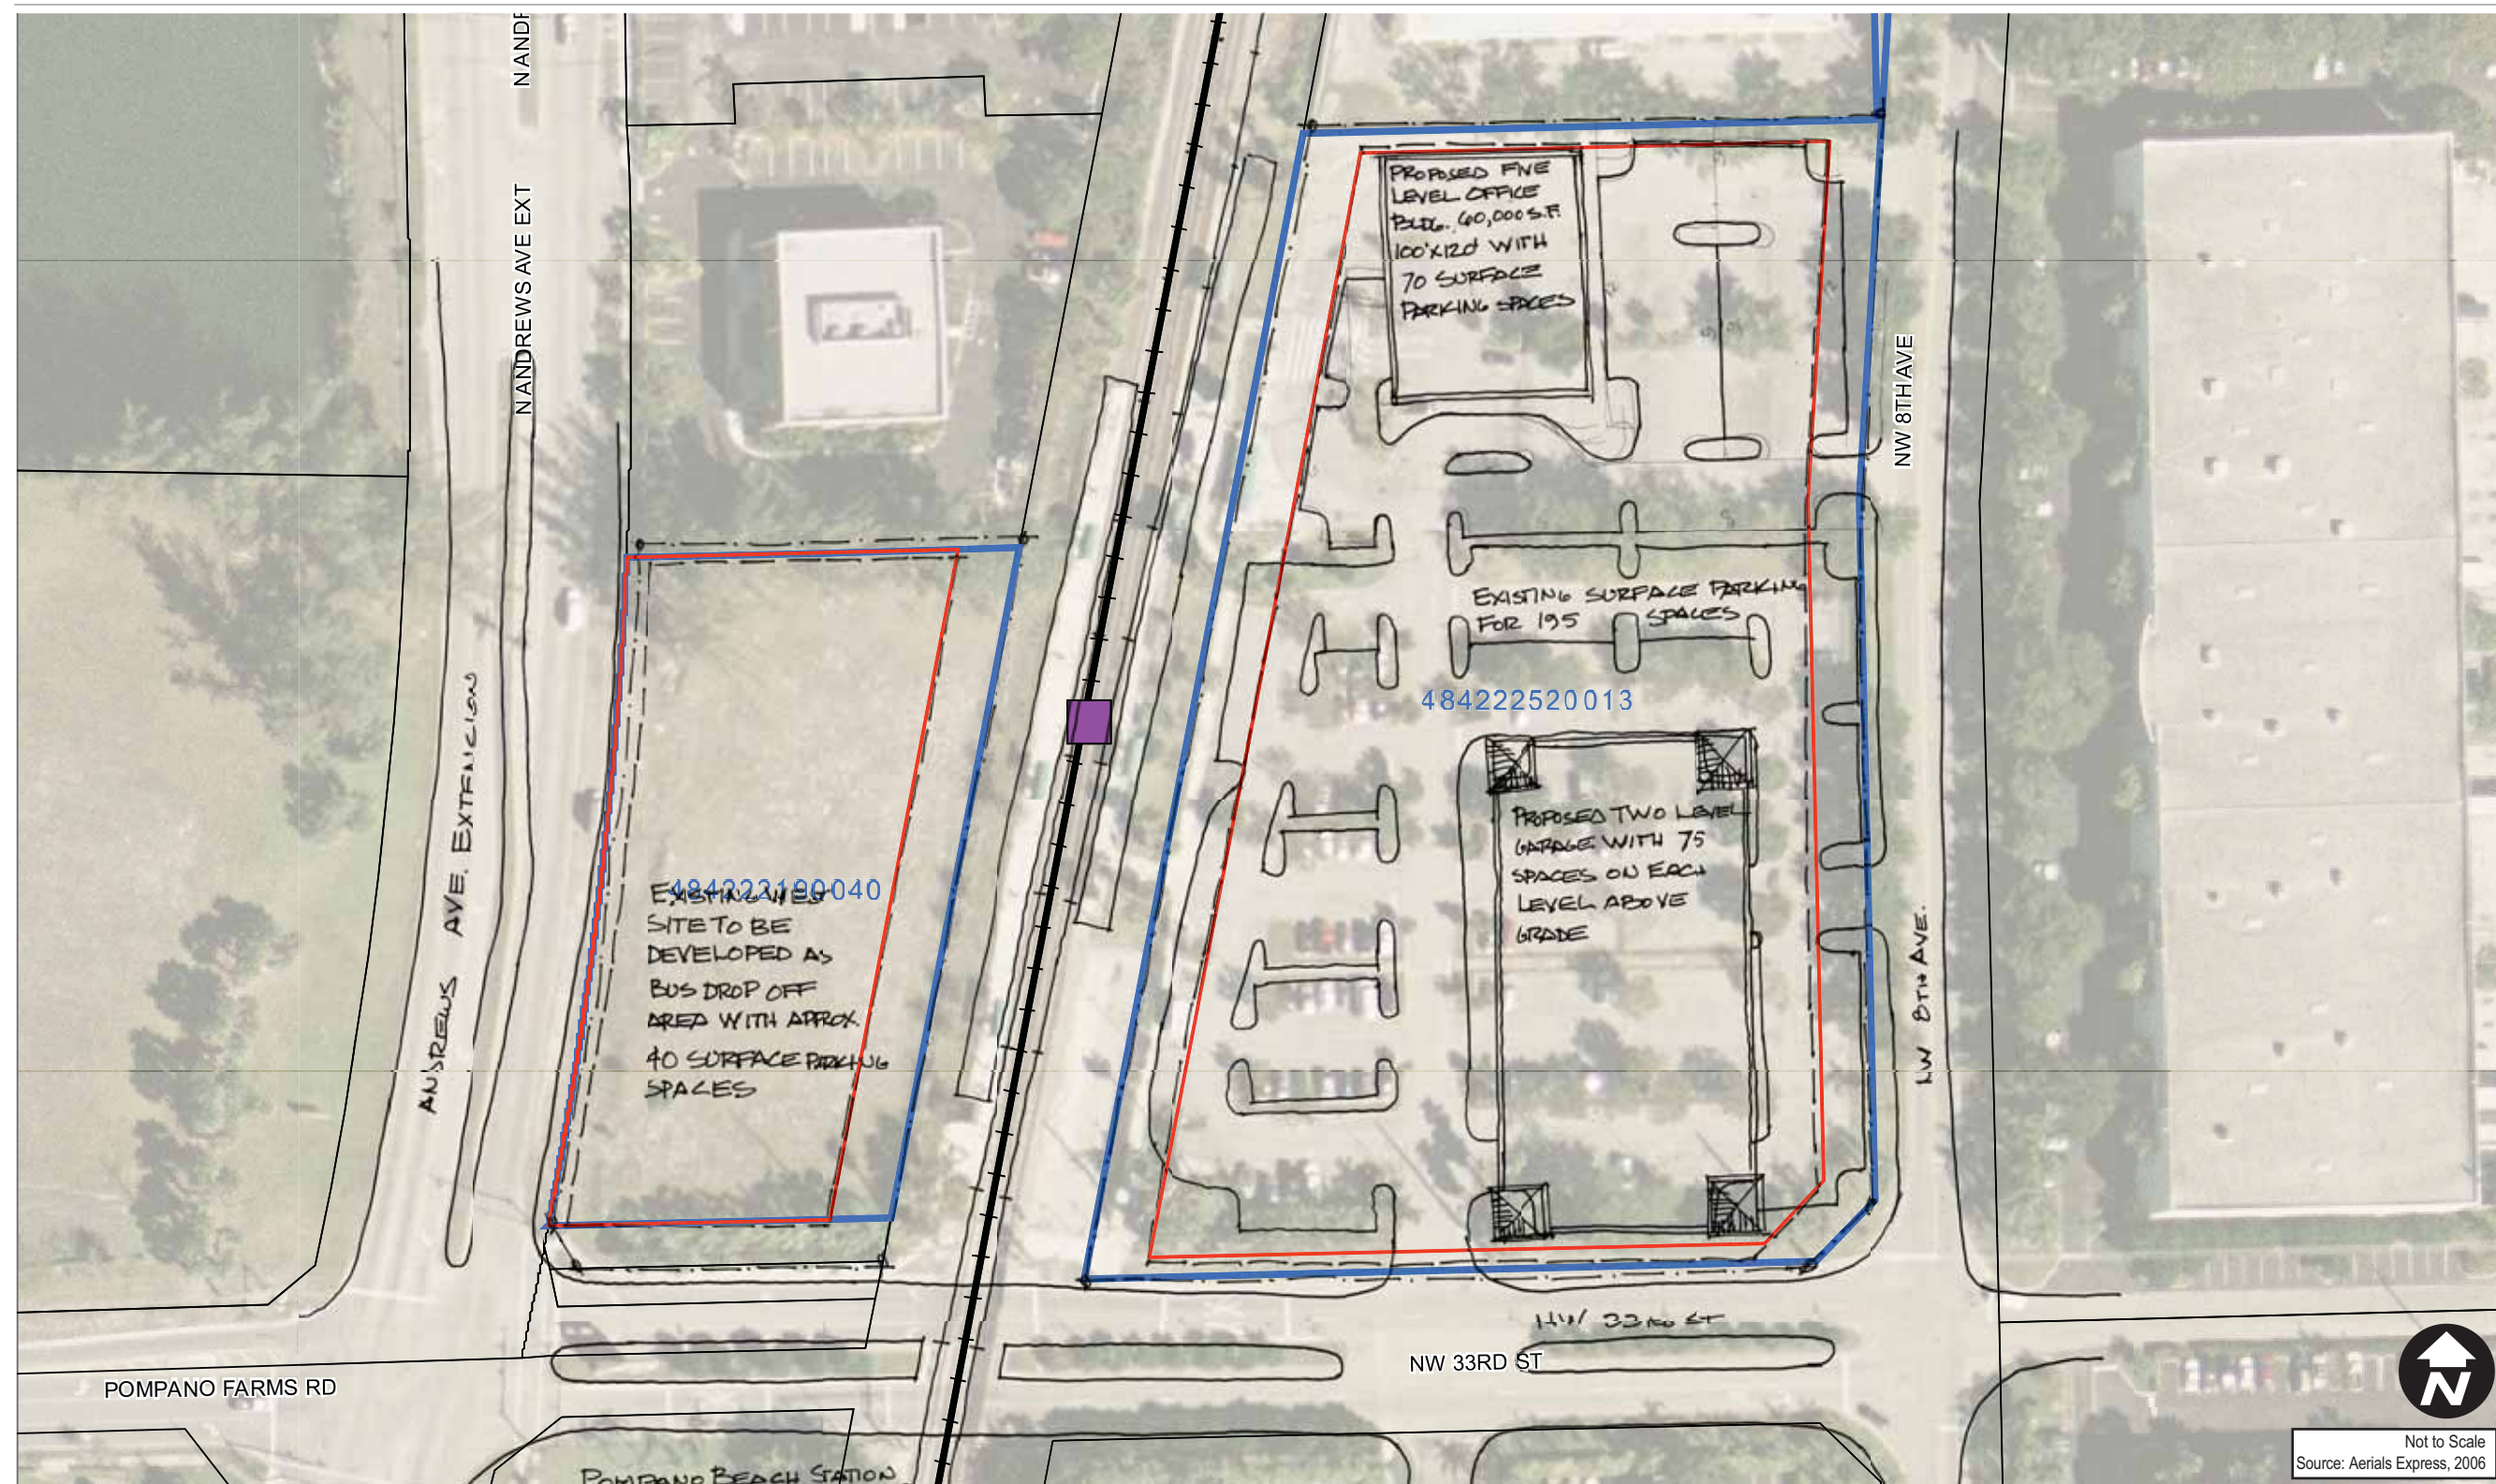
Pompano Beach East Site - Conceptual Site Plan
